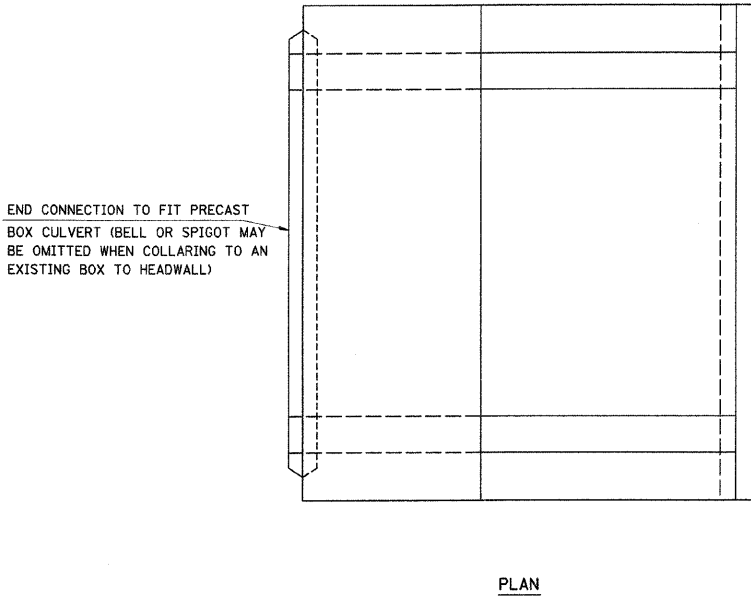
DETAIL OF PRECAST CONCRETE BOX CULVERT END SECTION
